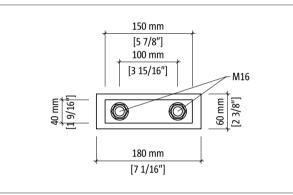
Schöck Isokorb® T Type S-N-D16: Elevation of the product
